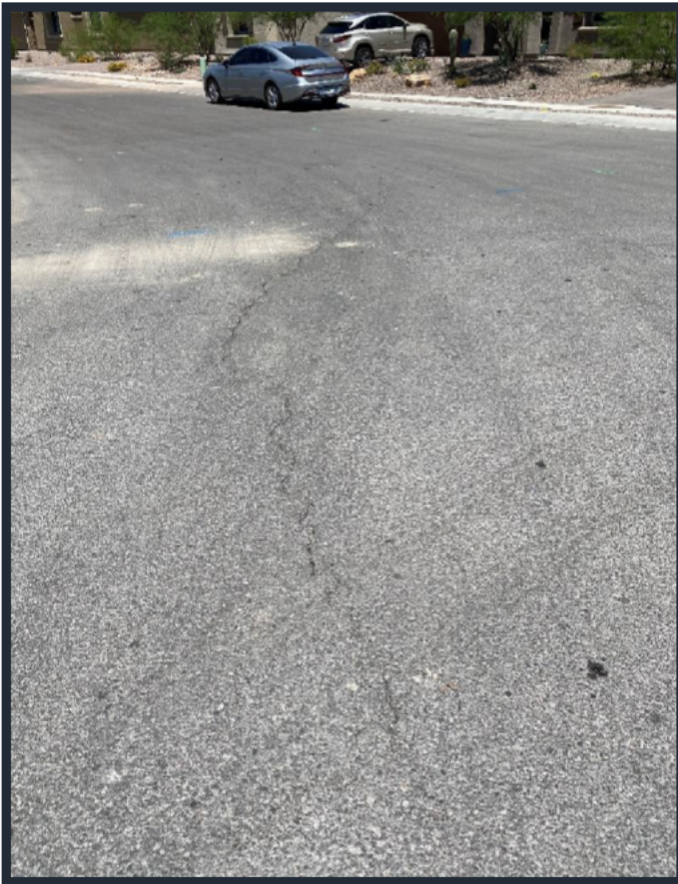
Cracks in the asphalt, looking northeast from middle of the road
